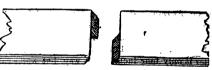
PLAN SHOWING END JOINTS OF FLOORING.
